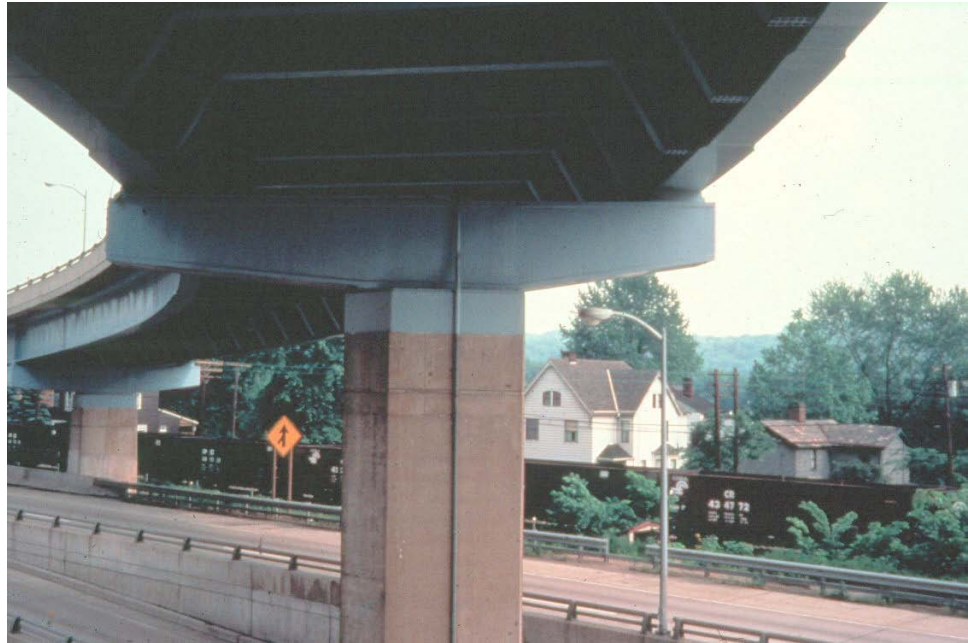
Combination: Reinforced Concrete Column with Steel Pier Cap
